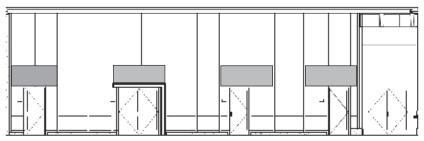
TYPICAL CONCEPT ELEVATION - RETAIL WALL SIGN
